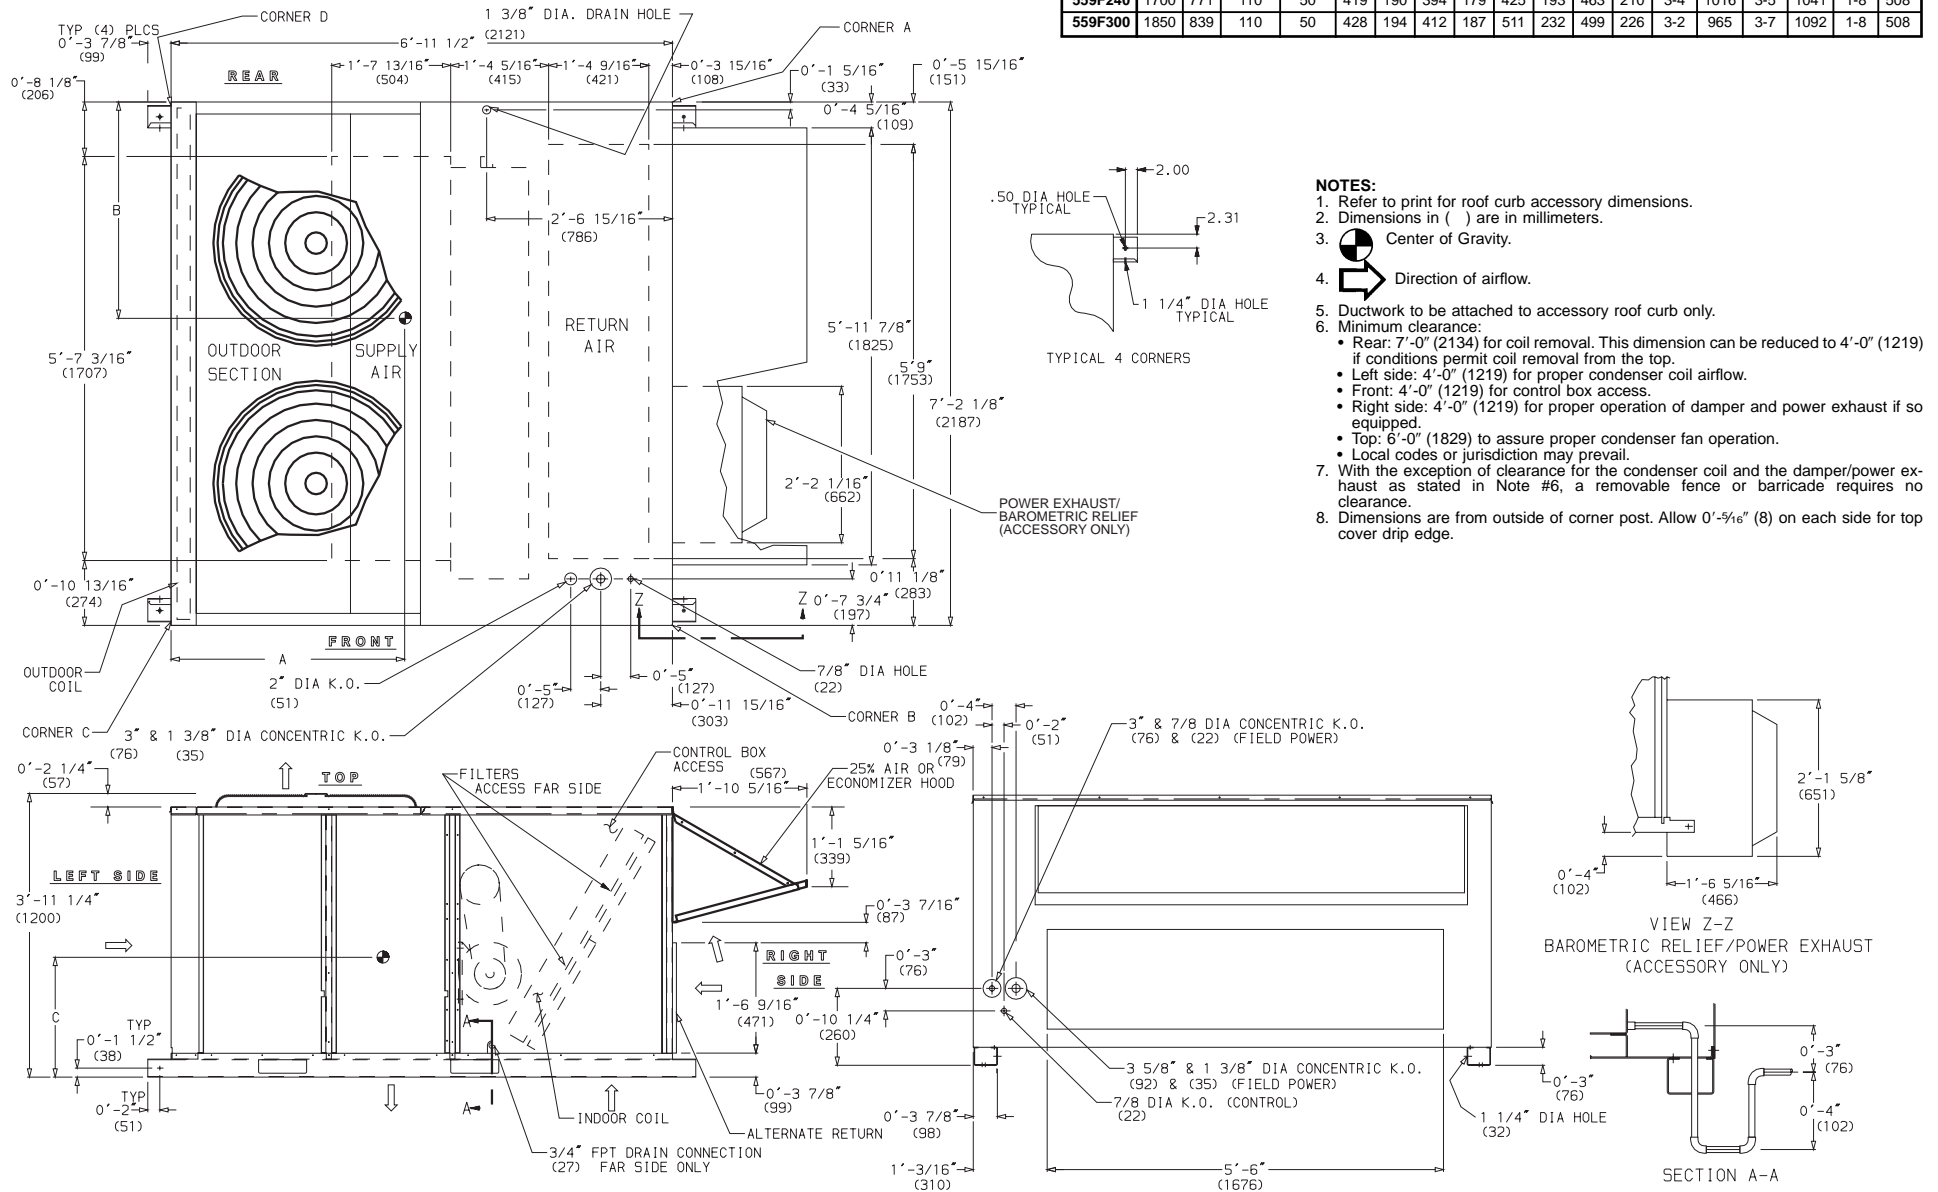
Base Unit Dimensions, 559F240 and 300
